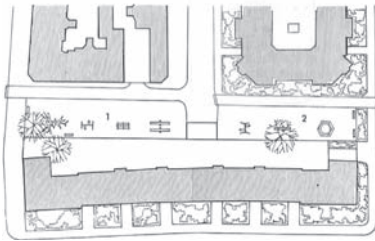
[above] Plan of one of Copenhagen' Play Streets.
